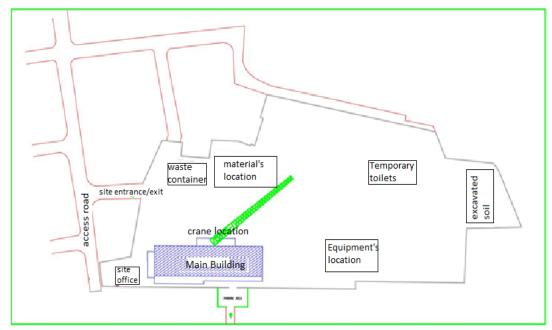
2D Site Plan for Construction Jobsite Scenario One
